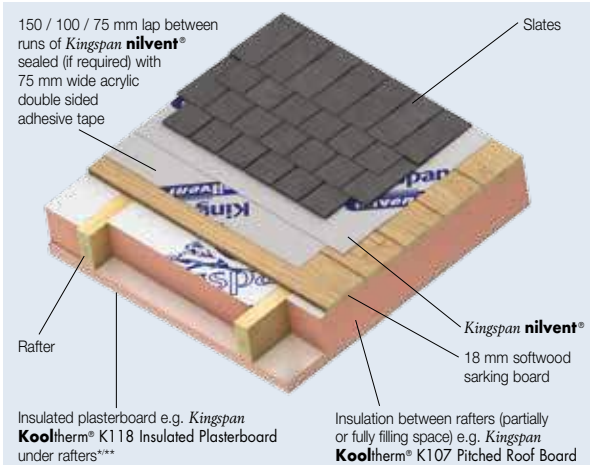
Insulation Between Rafters – Sarking Board & Natural Slates
